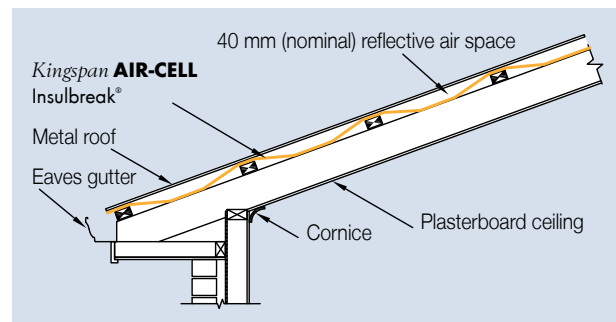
Side elevation of *Kingspan AIR-CELL Insulbreak®* in a metal roof with a raked ceiling
